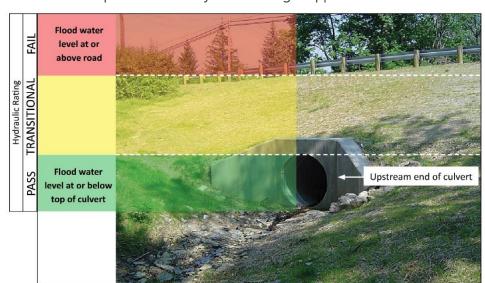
Example of how the hydraulic rating is applied to a culvert evaluation.
